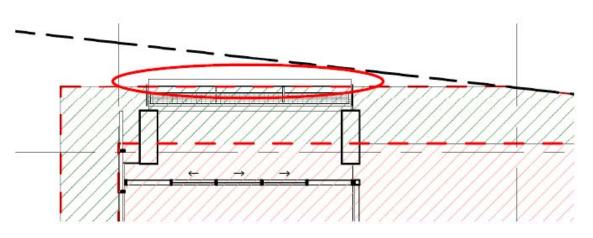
Detail showing extent of protrusion of balconies beyond approved building envelope (levels 25-66)
